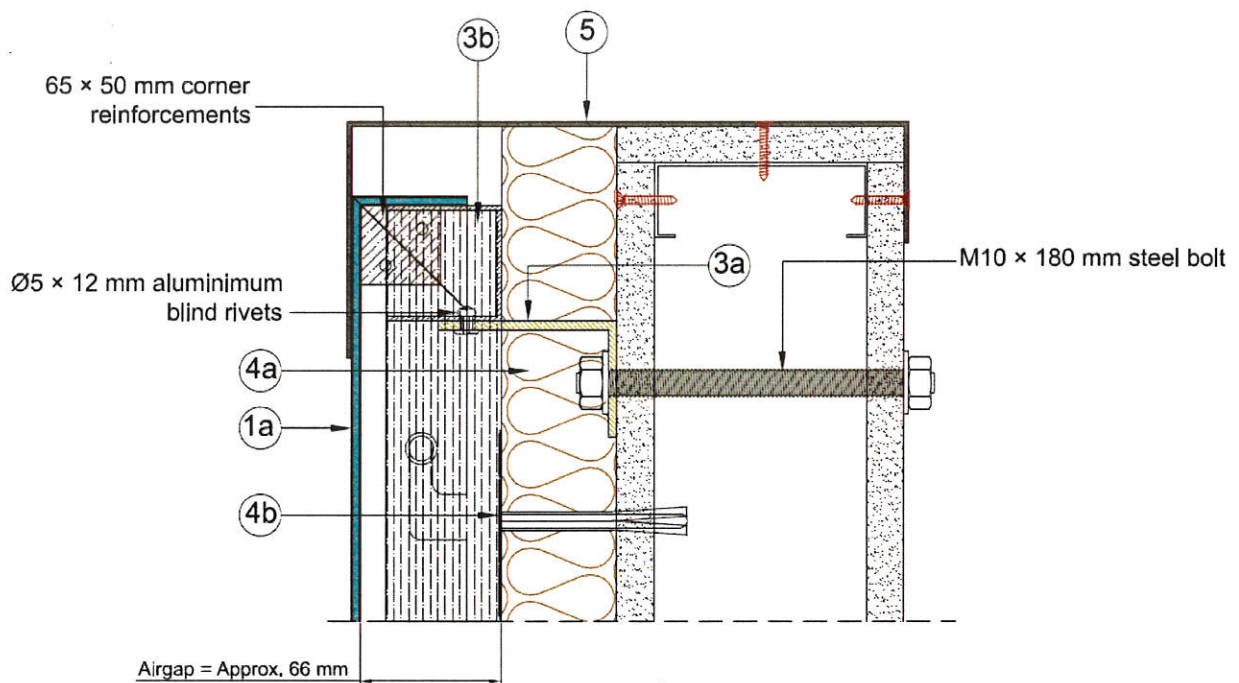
"ALBOND A2" 4.0 mm thick Aluminium Composite Material Non-Load-Bearing Exterior Wall Cladding Assembly vertical window section details
